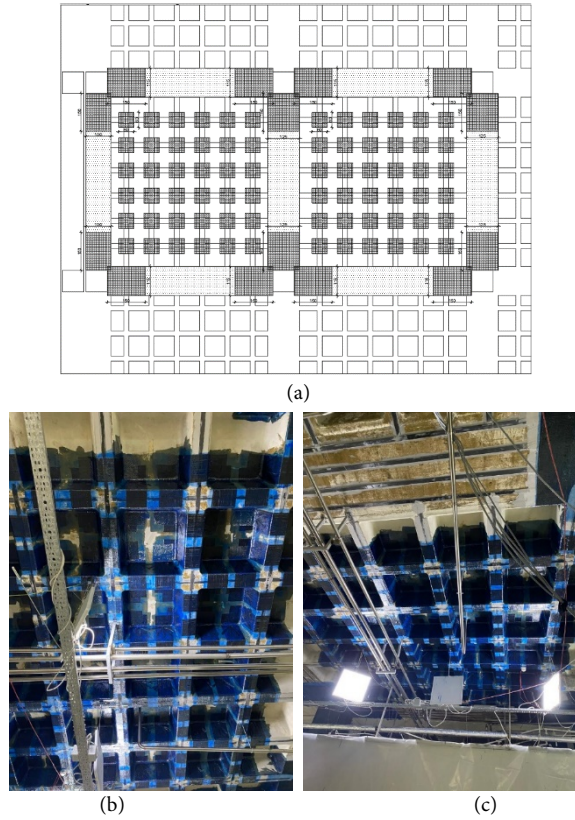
Second Floor CFRP Fabric Reinforcement (a) Project Layout (b, c) Application Area
